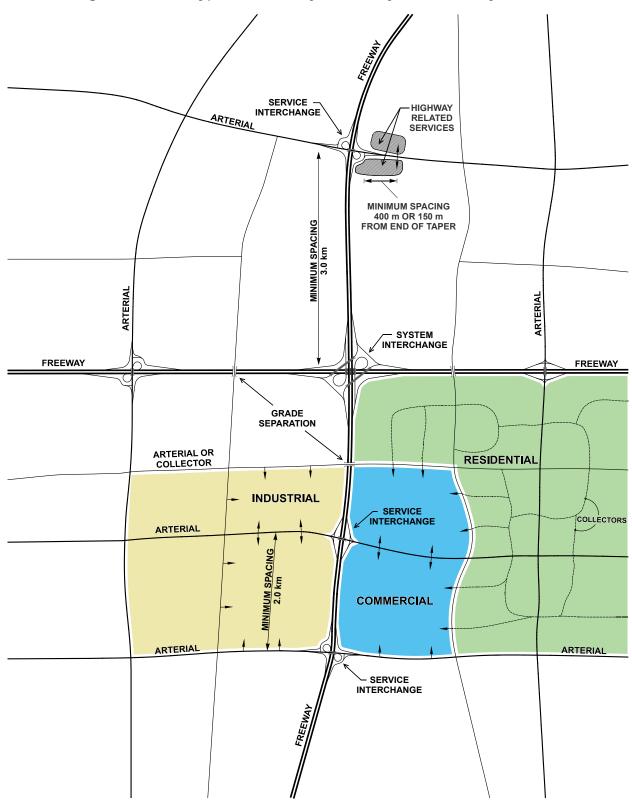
Typical Roadway Hierarchy and Freeway Access
